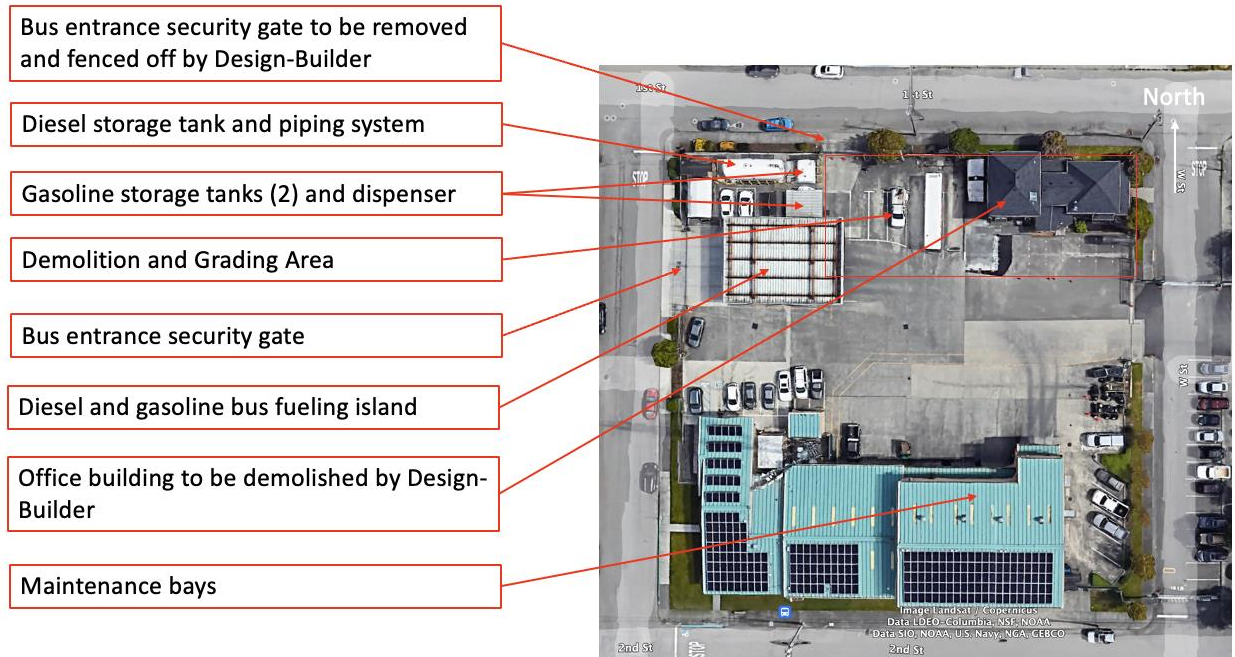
Existing infrastructure and equipment adjacent to the Project site.
